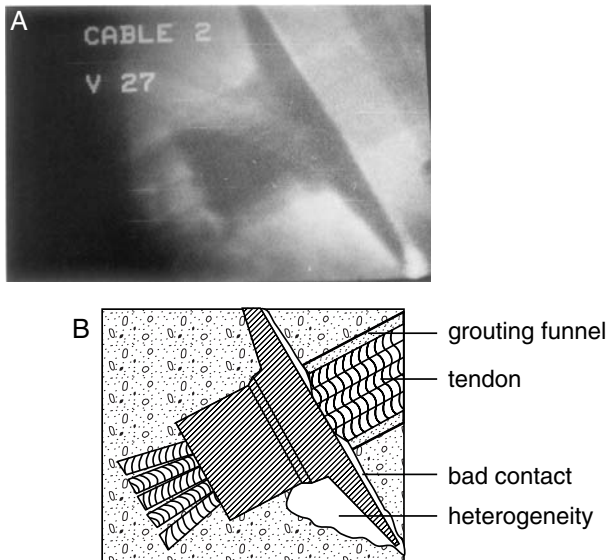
Scorpion X-radioscopic image of prestressing cable anchorage in concrete: (A) photograph of radioscopic image; (B) schematic of cable anchorage and interpretation of photograph. (Photo courtesy of Laboratoire Régional des Ponts-et-Chaussées de BLOIS.)
